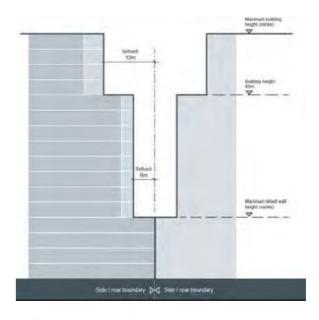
Section illustrating minimum side and rear setbacks
